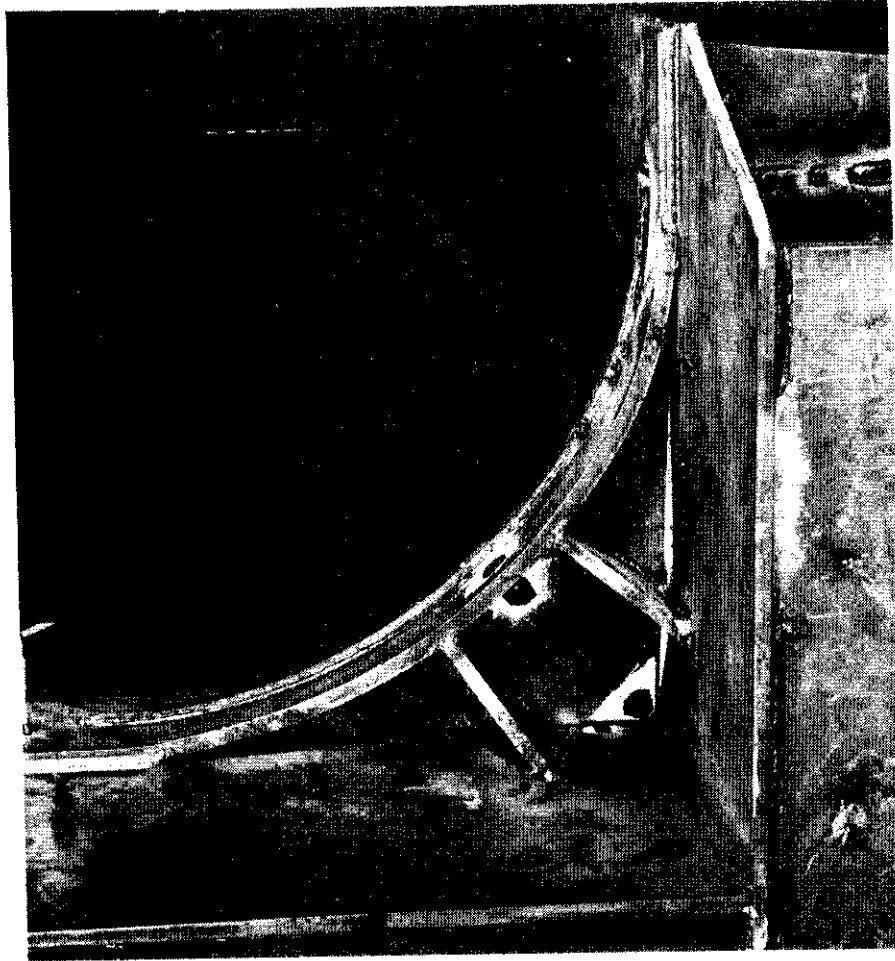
Specimen 28: View of gusset plate reinforcement from below
